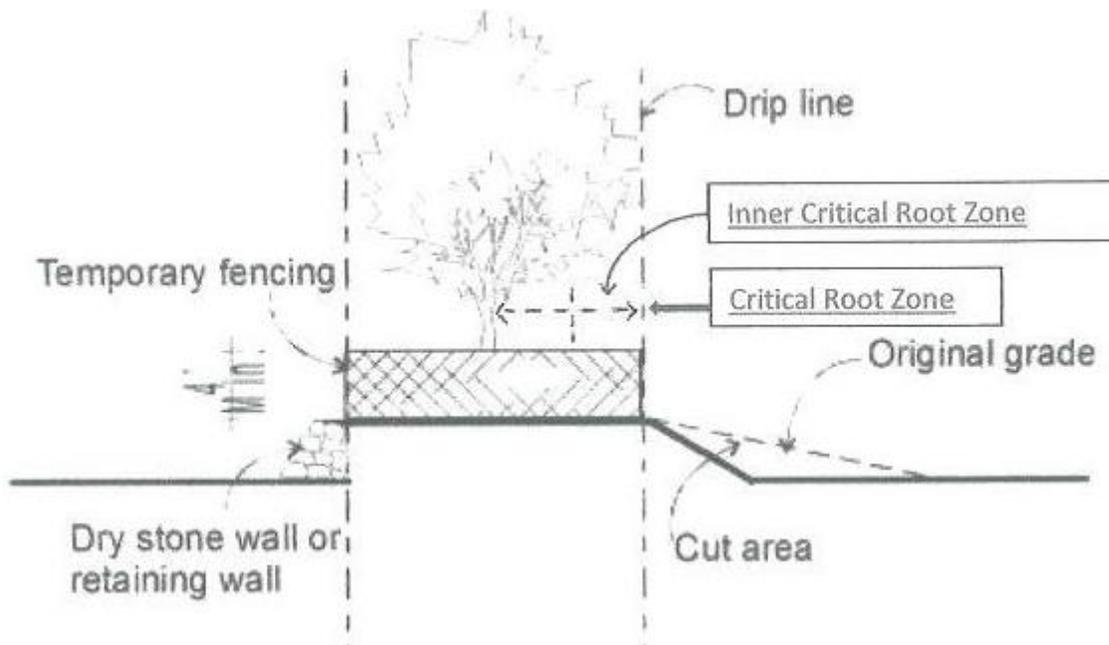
Illustration of standard techniques used to protect trees during construction.
